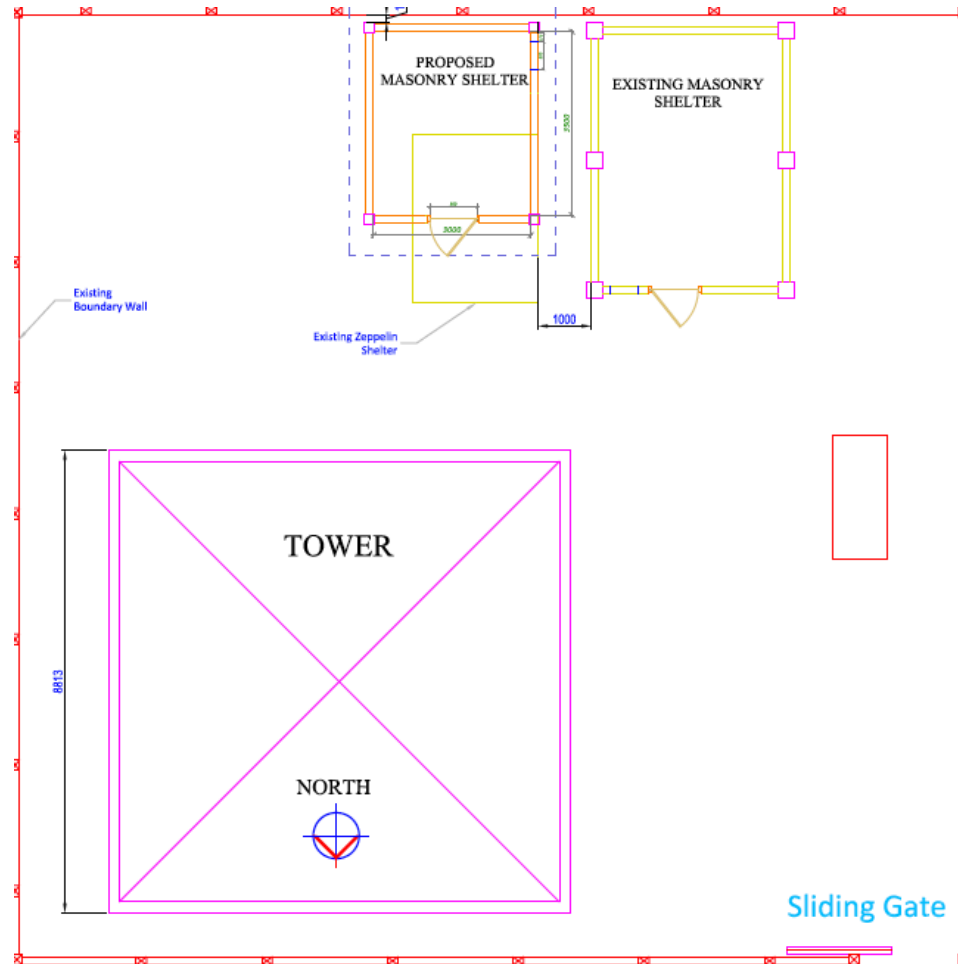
Site plan of masonry shelter in Thinadhoo, Gaafu Dhaalu
